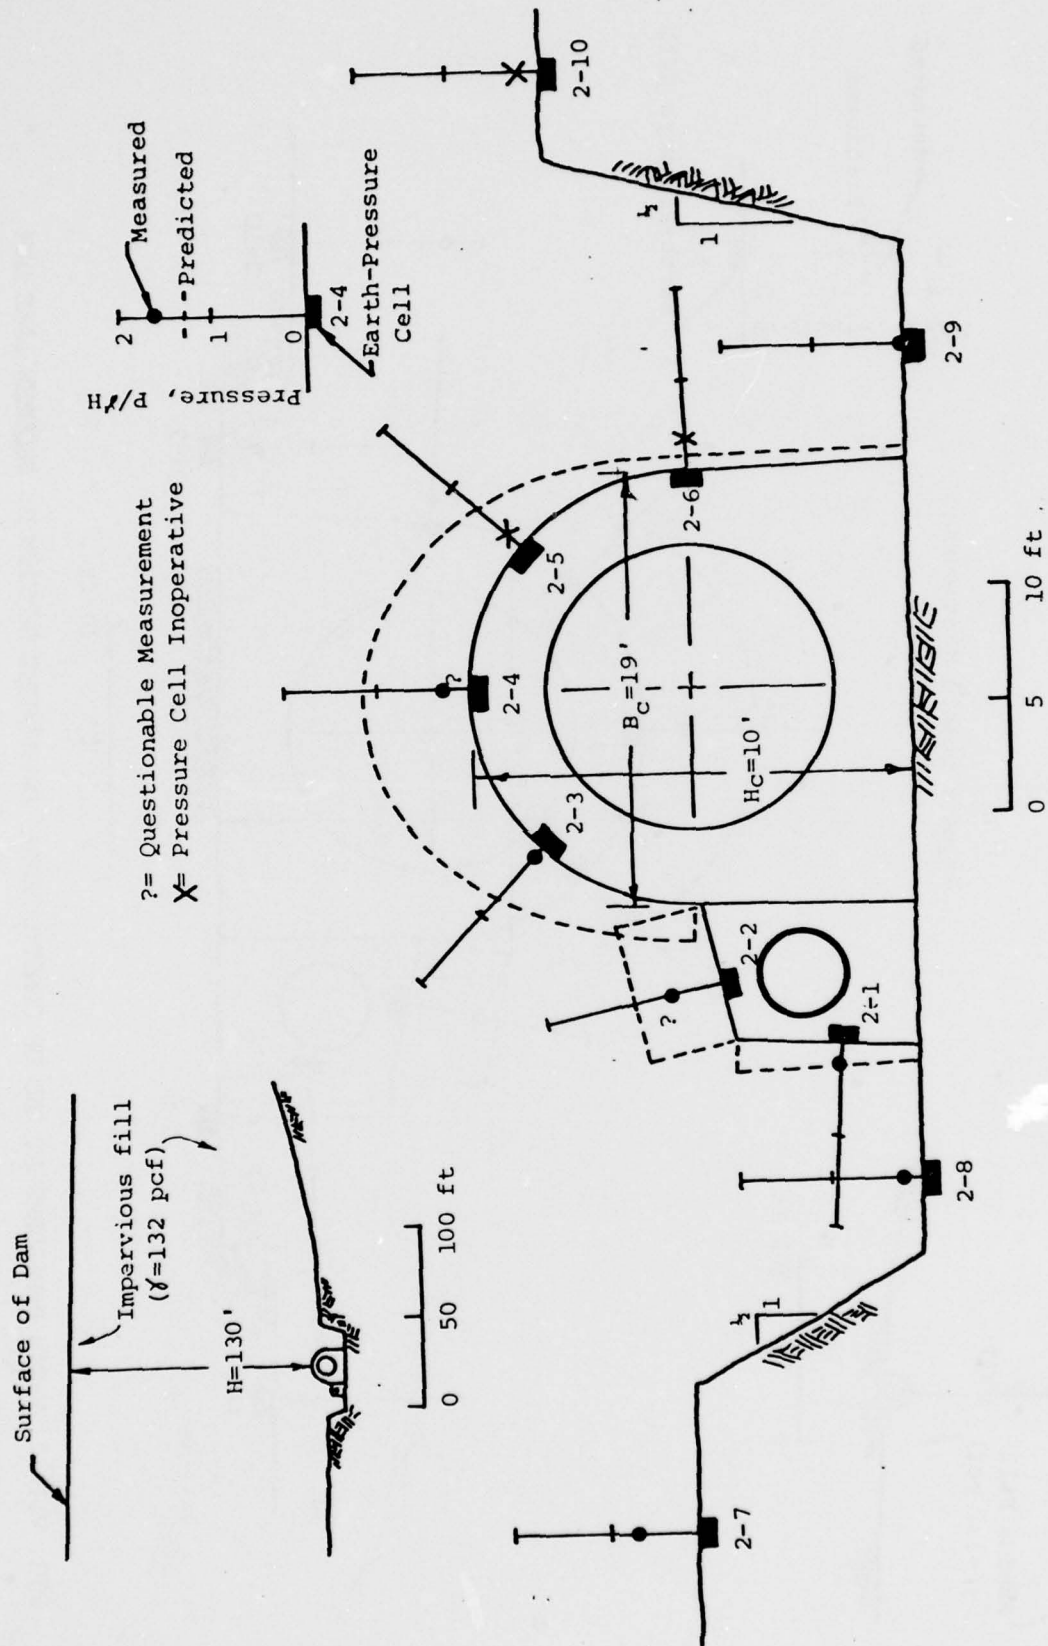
EARTH PRESSURES AT END OF CONSTRUCTION, INSTRUMENT STATION A, DEQUEEN LAKE DAM
